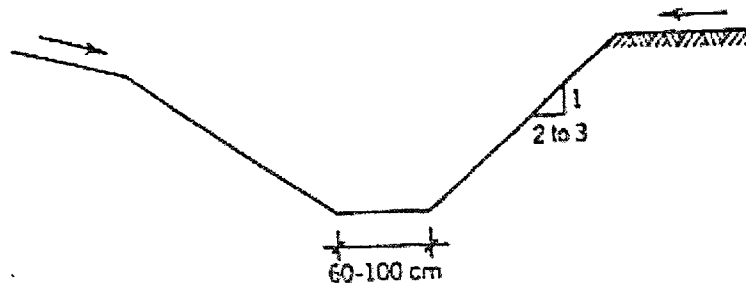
Typical cross section of drainage ditch (Bagchi, 1989)
